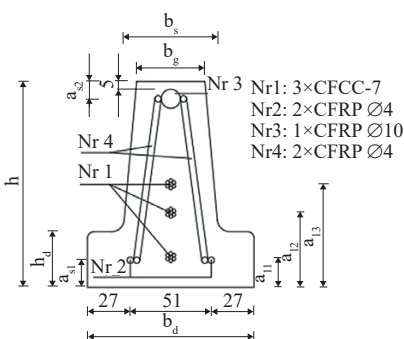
Cross-section of RS139c prestressed concrete beam after the use of CFCC tendons and CFRP bars
